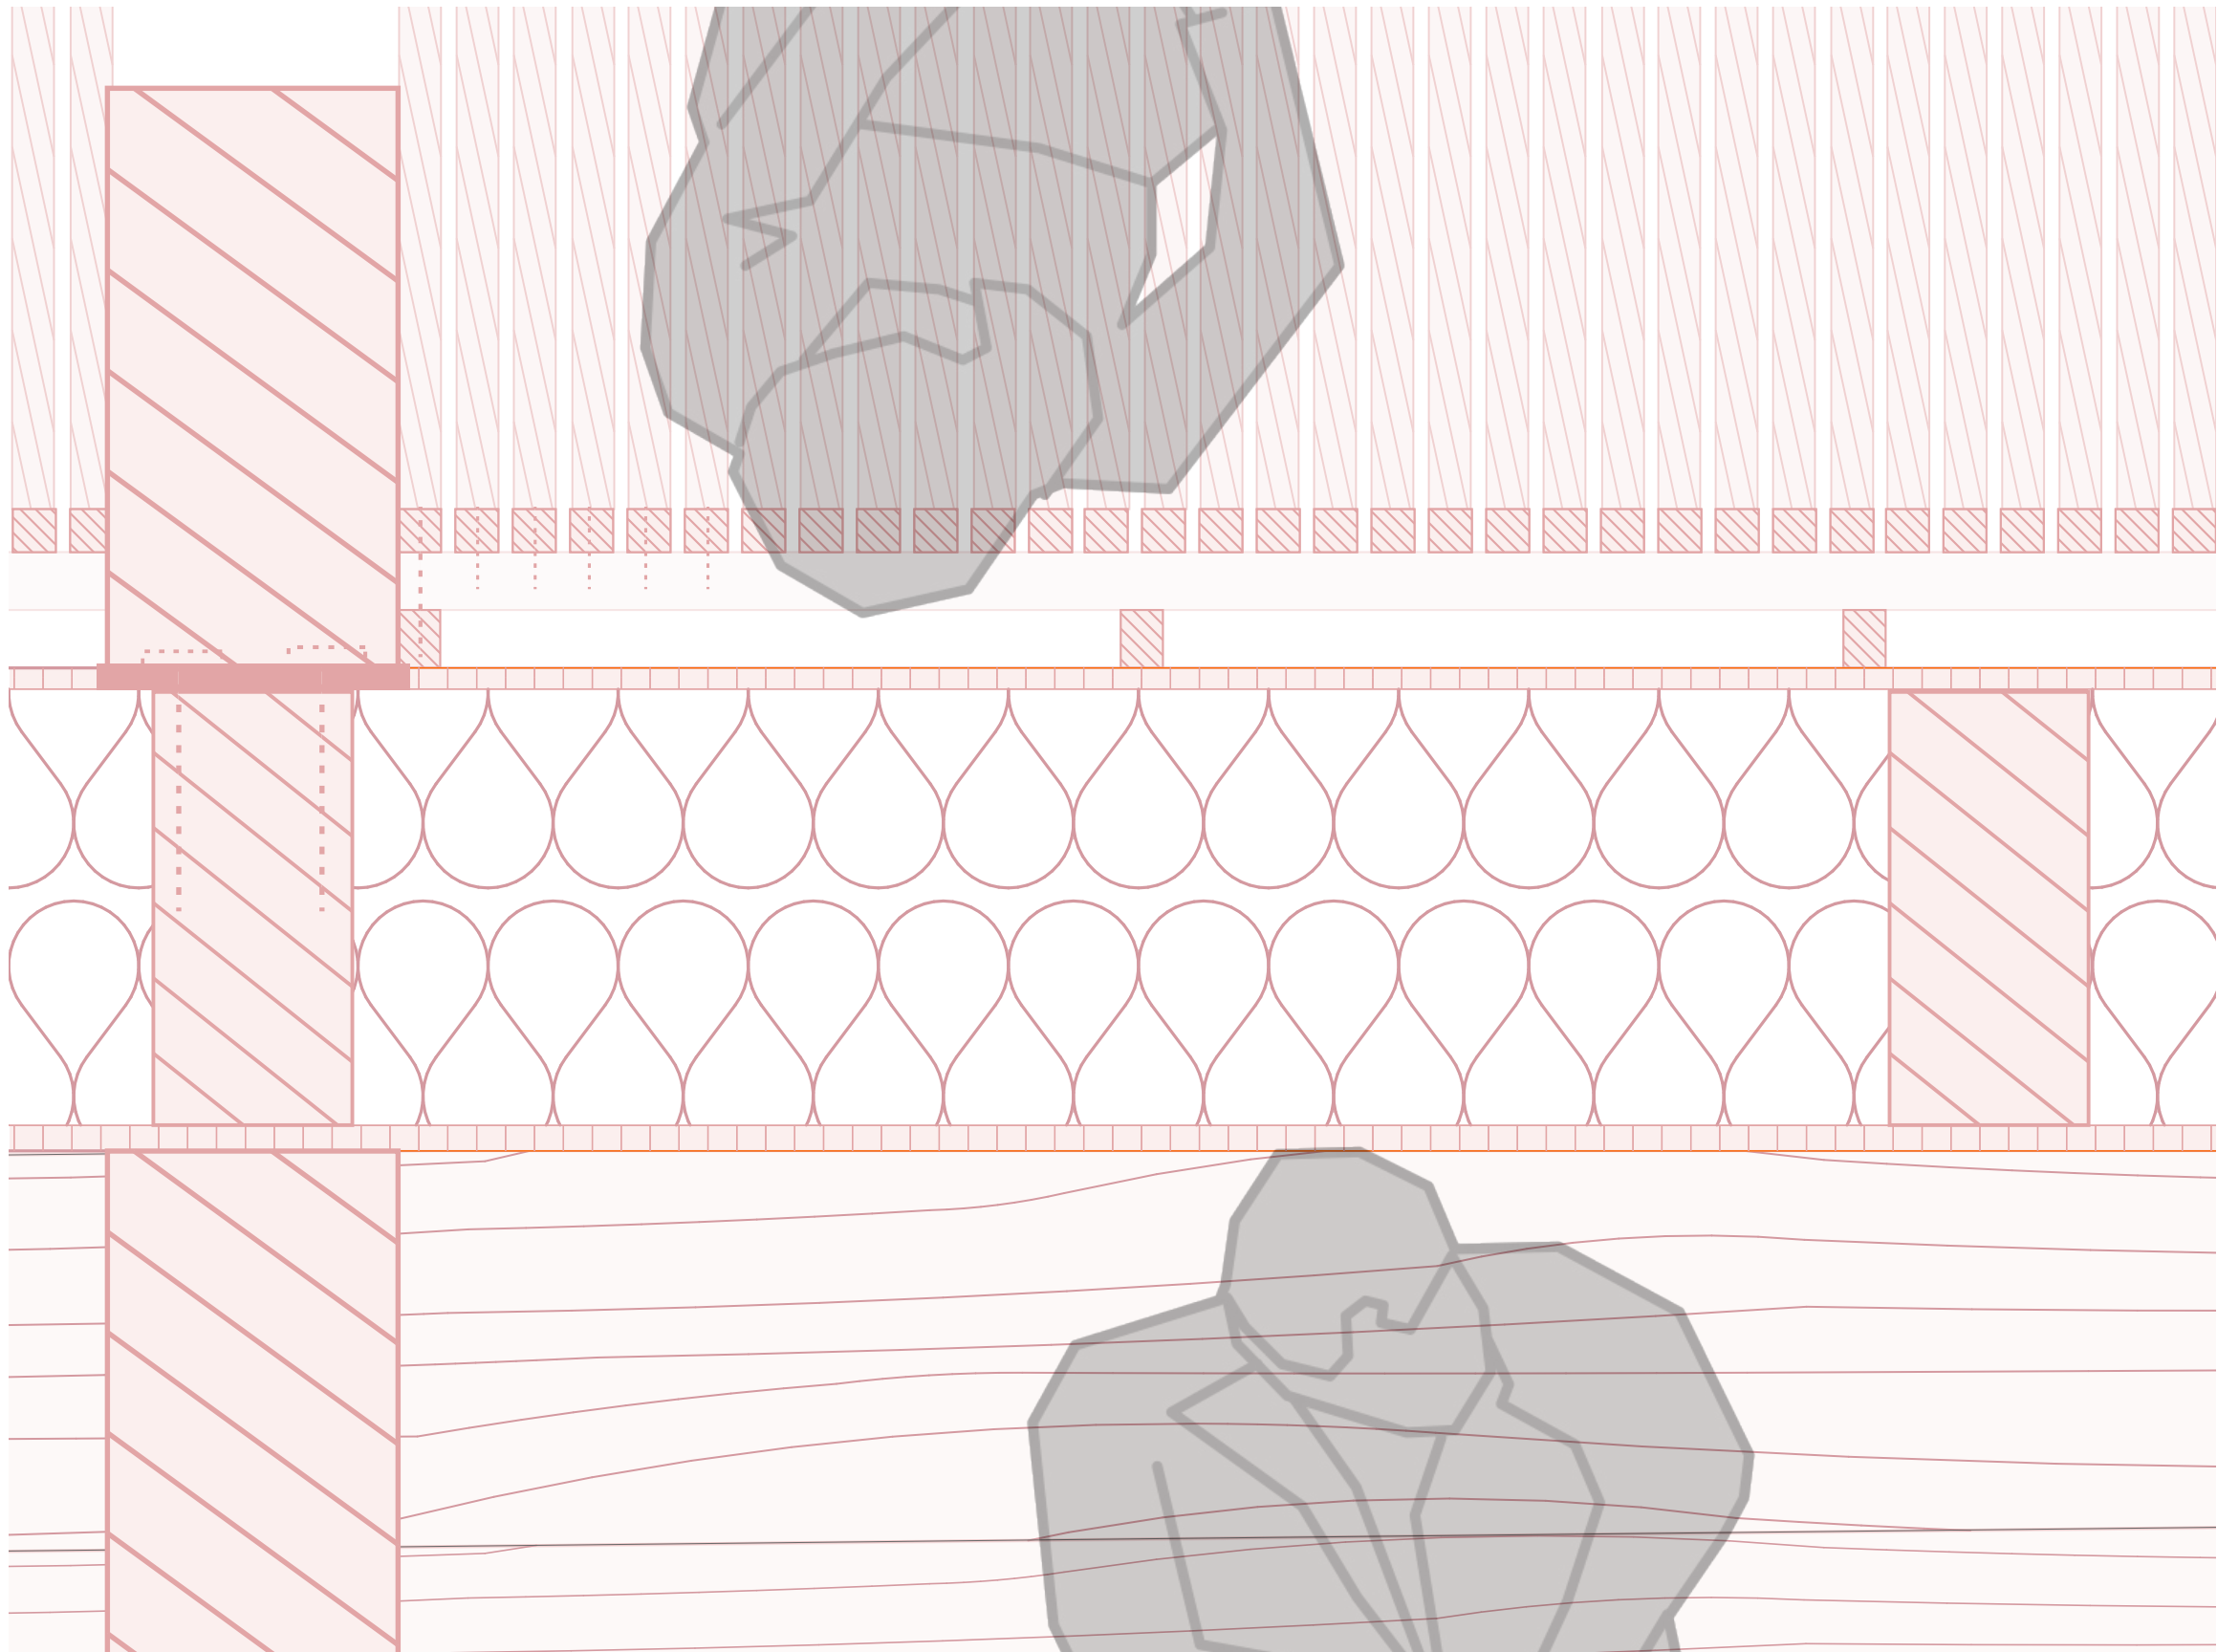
North facade's integrated bay-window seats and outdoor bench seating (horizontal section), scale 1:5
